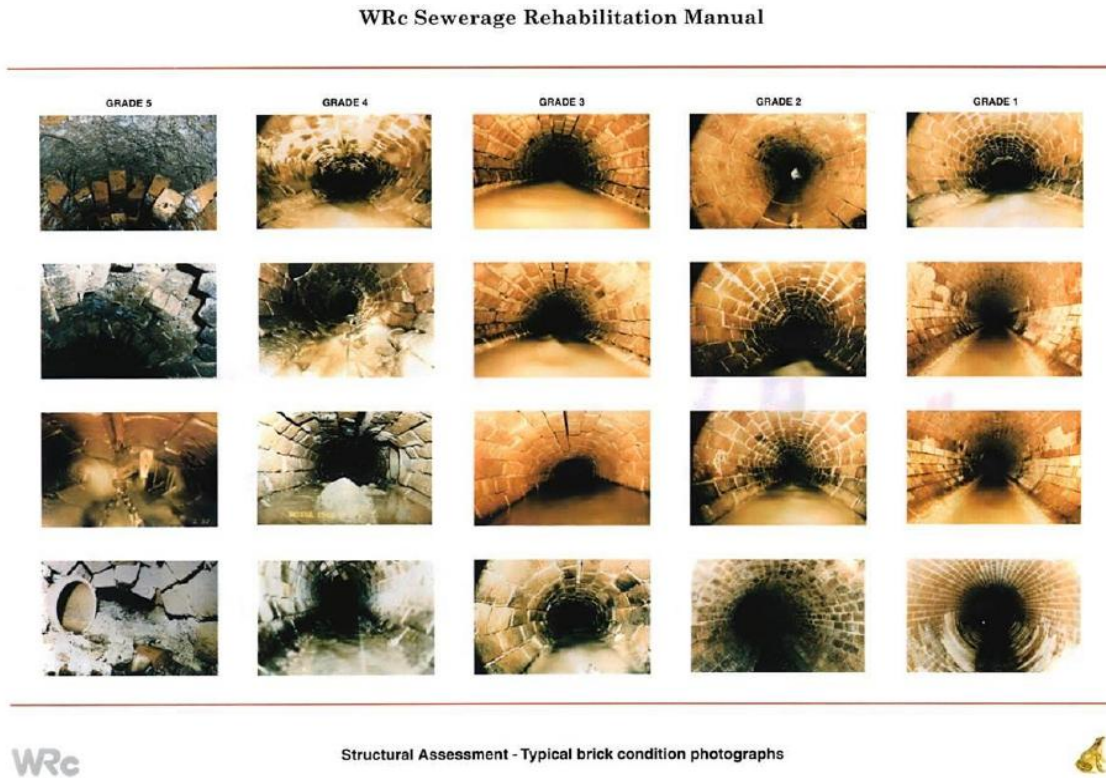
WRC Structural Assessment Poster for Brick Culverts
